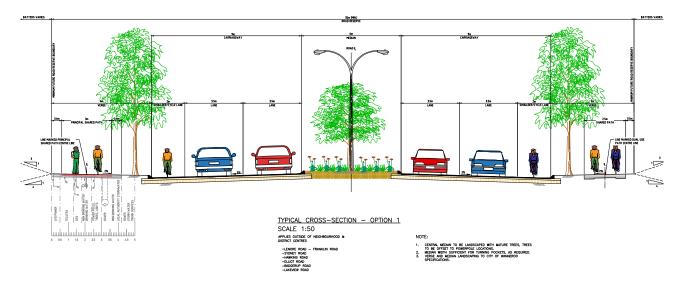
Cross-section applies outside of District and Neighbourhood centres
